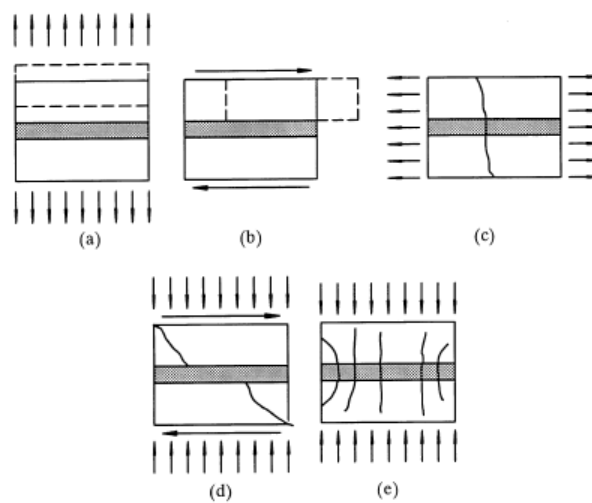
Failure mechanisms of masonry: (a) tensile cracking at joints, (b) joint slipping, (c) tensile cracking of units (d) diagonal tensile cracking of masonry and (e) masonry crushing. (Lourenço, 1996).
